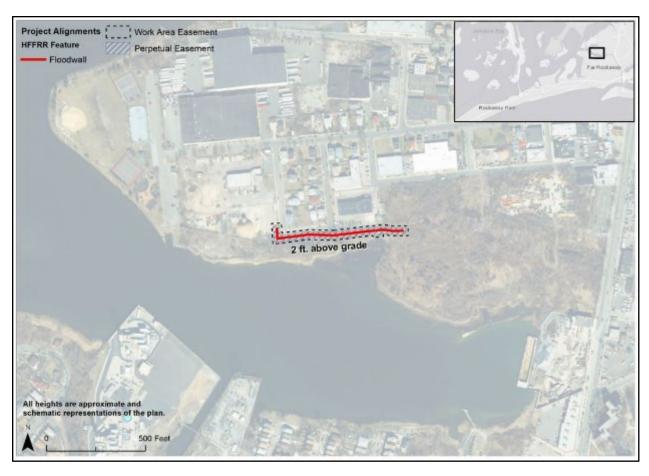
Aerial photo with plan layout of Motts Basin North HFFRRF. Illustration credit: USACE (2018a).
